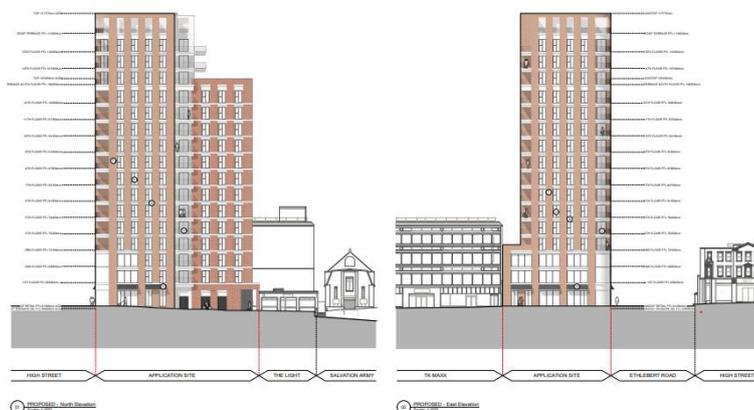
Previous refused scheme (ref: 19/04588/FULL1) – North and East elevations.
